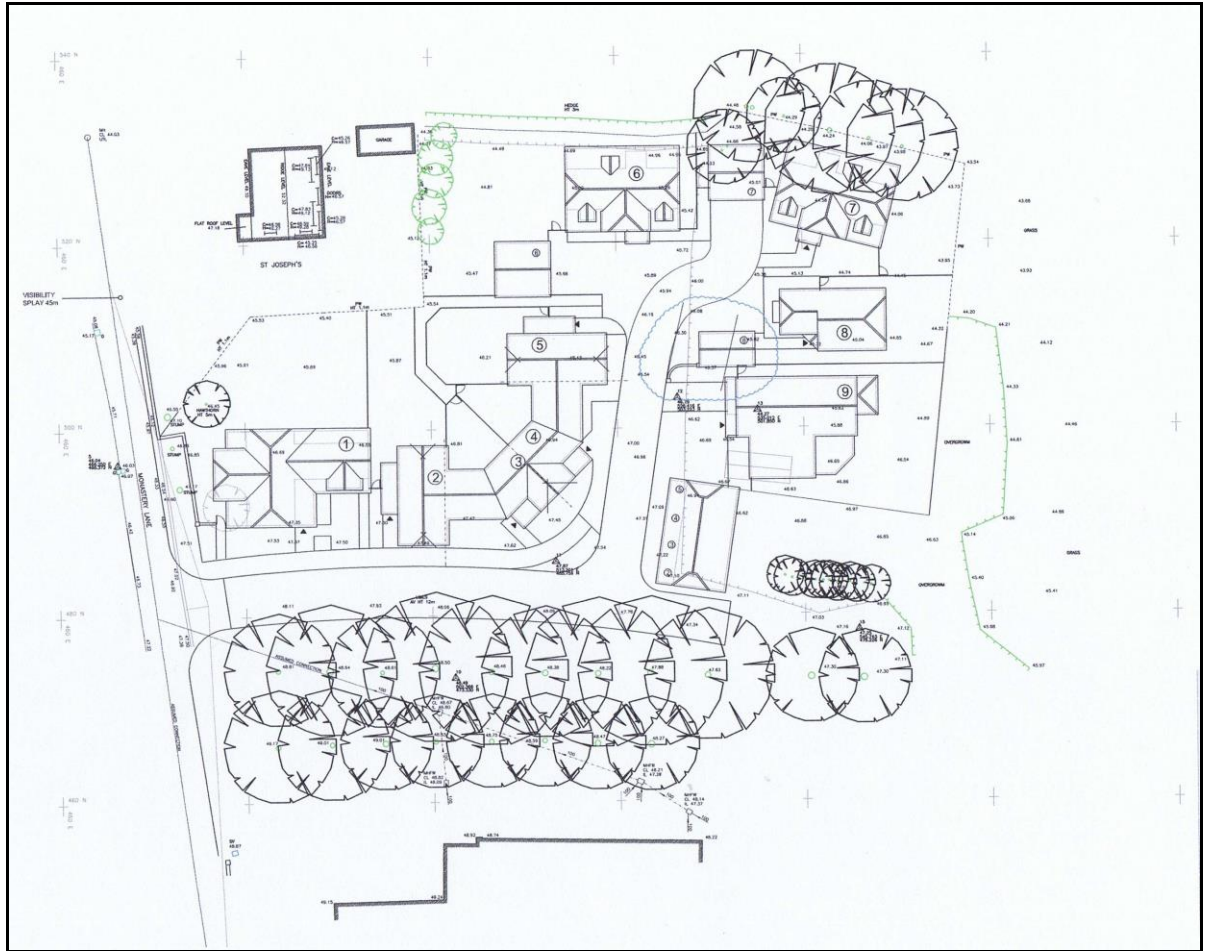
Monastery Lane, Storrington: Proposed development plan
